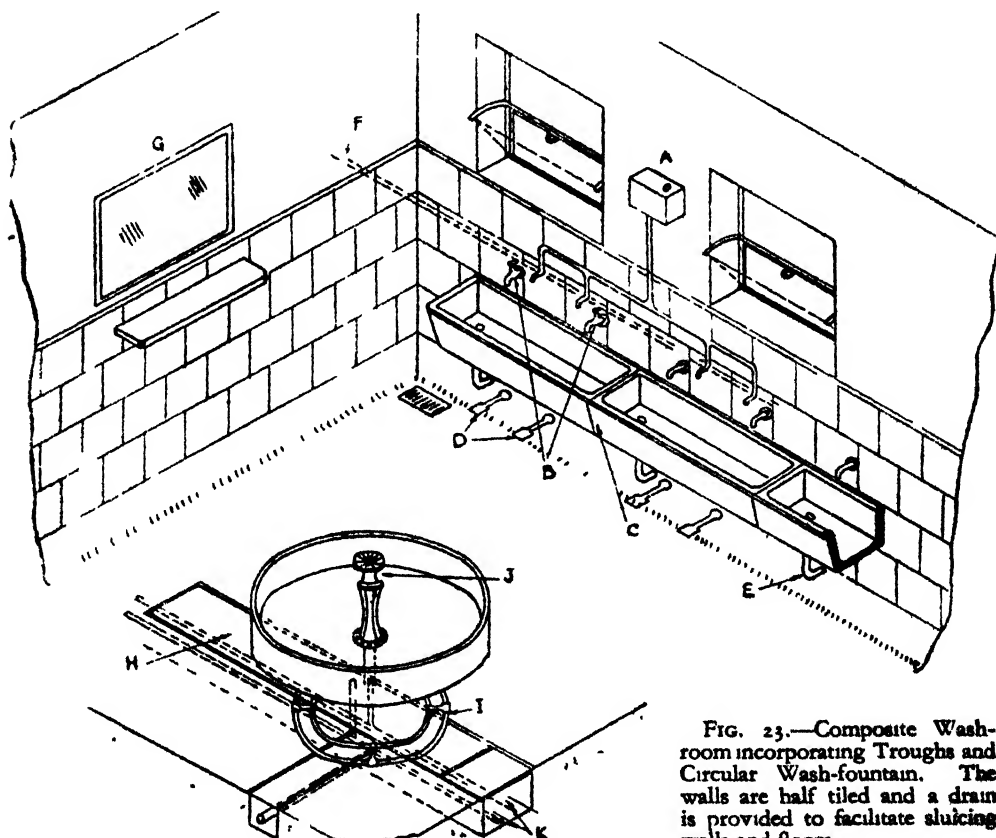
Composite Wash-room incorporating Troughs and Circular Wash-fountain. The walls are half tiled and a drain is provided to facilitate sluicing walls and floors.
